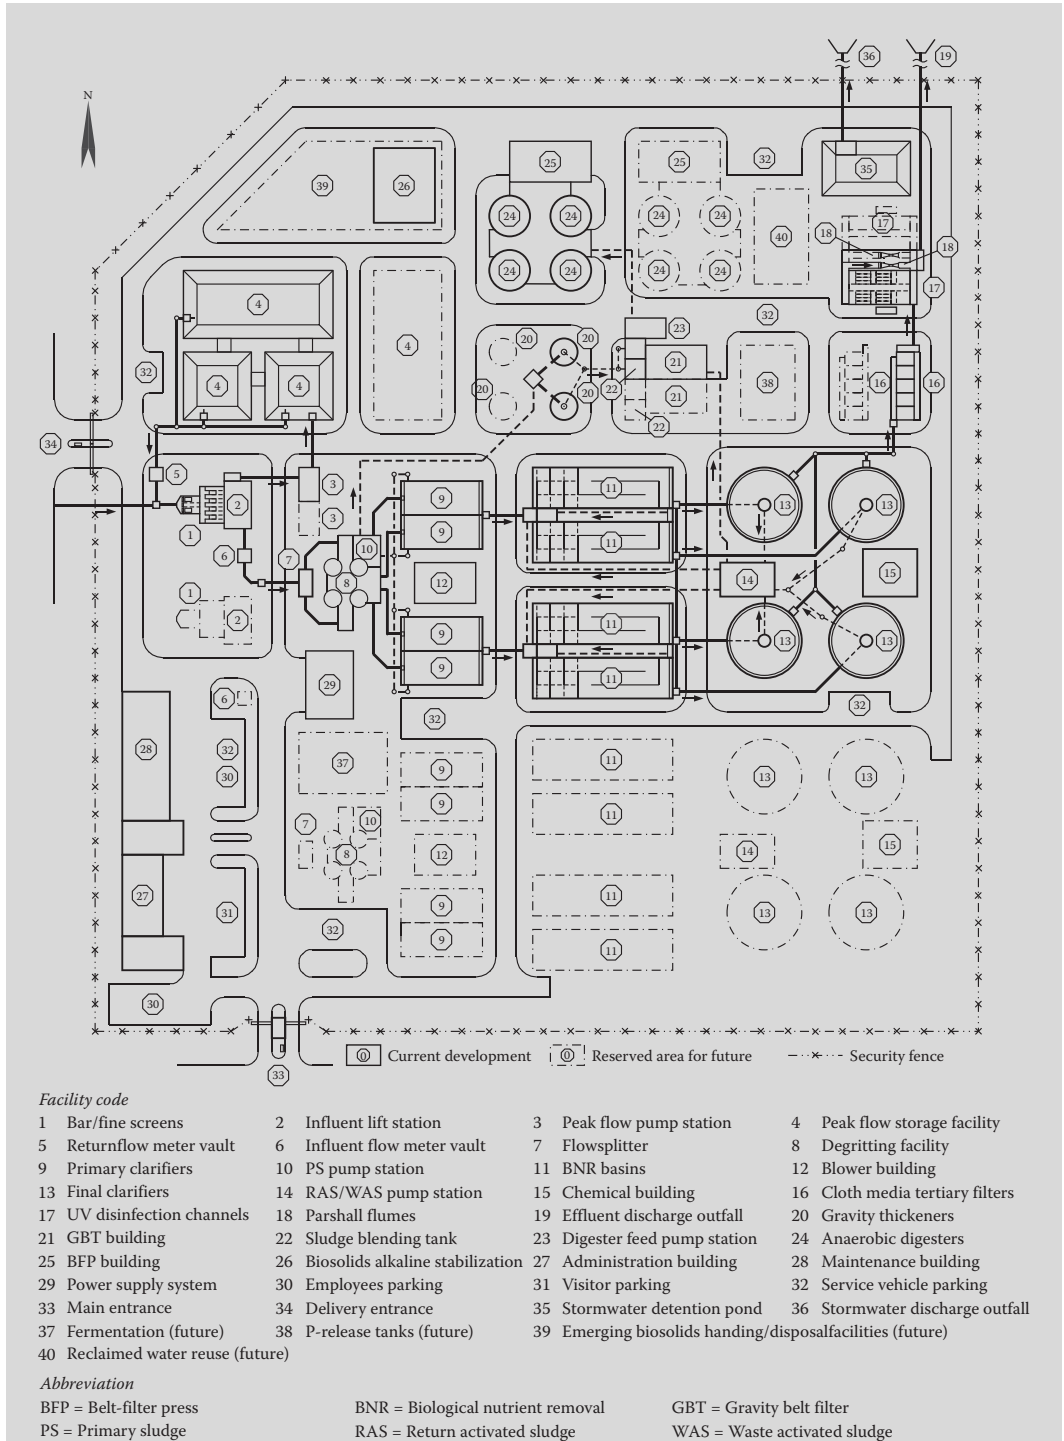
Conceptual layout of the wastewater treatment plant (Example 14.2).
